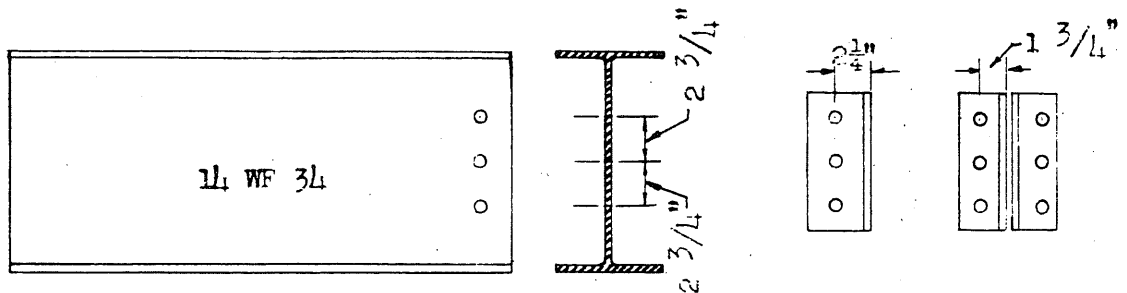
SCHEMATIC DRAWING OF TESTING ARRANGEMENT FOR BEAM-TO-COLUMN CONNECTIONS
